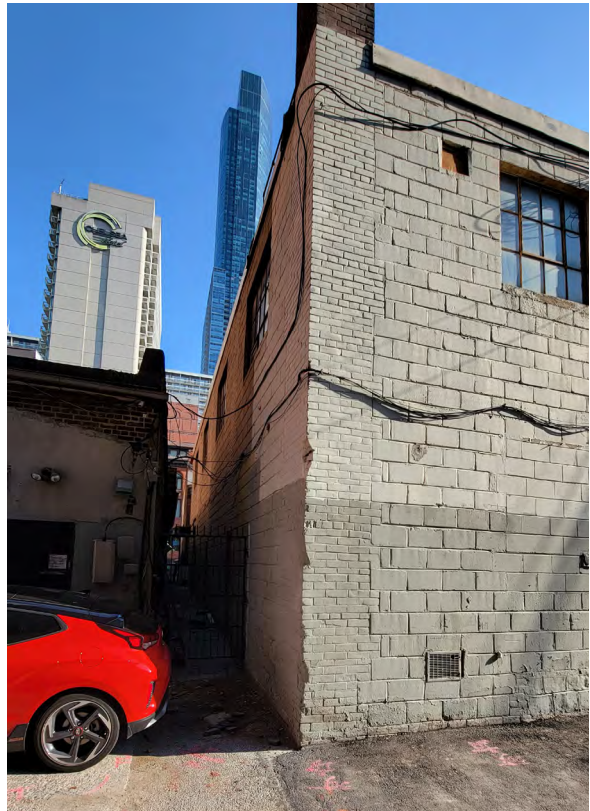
Chimney and corner brickwork are in poor condition (ERA, 2022).
